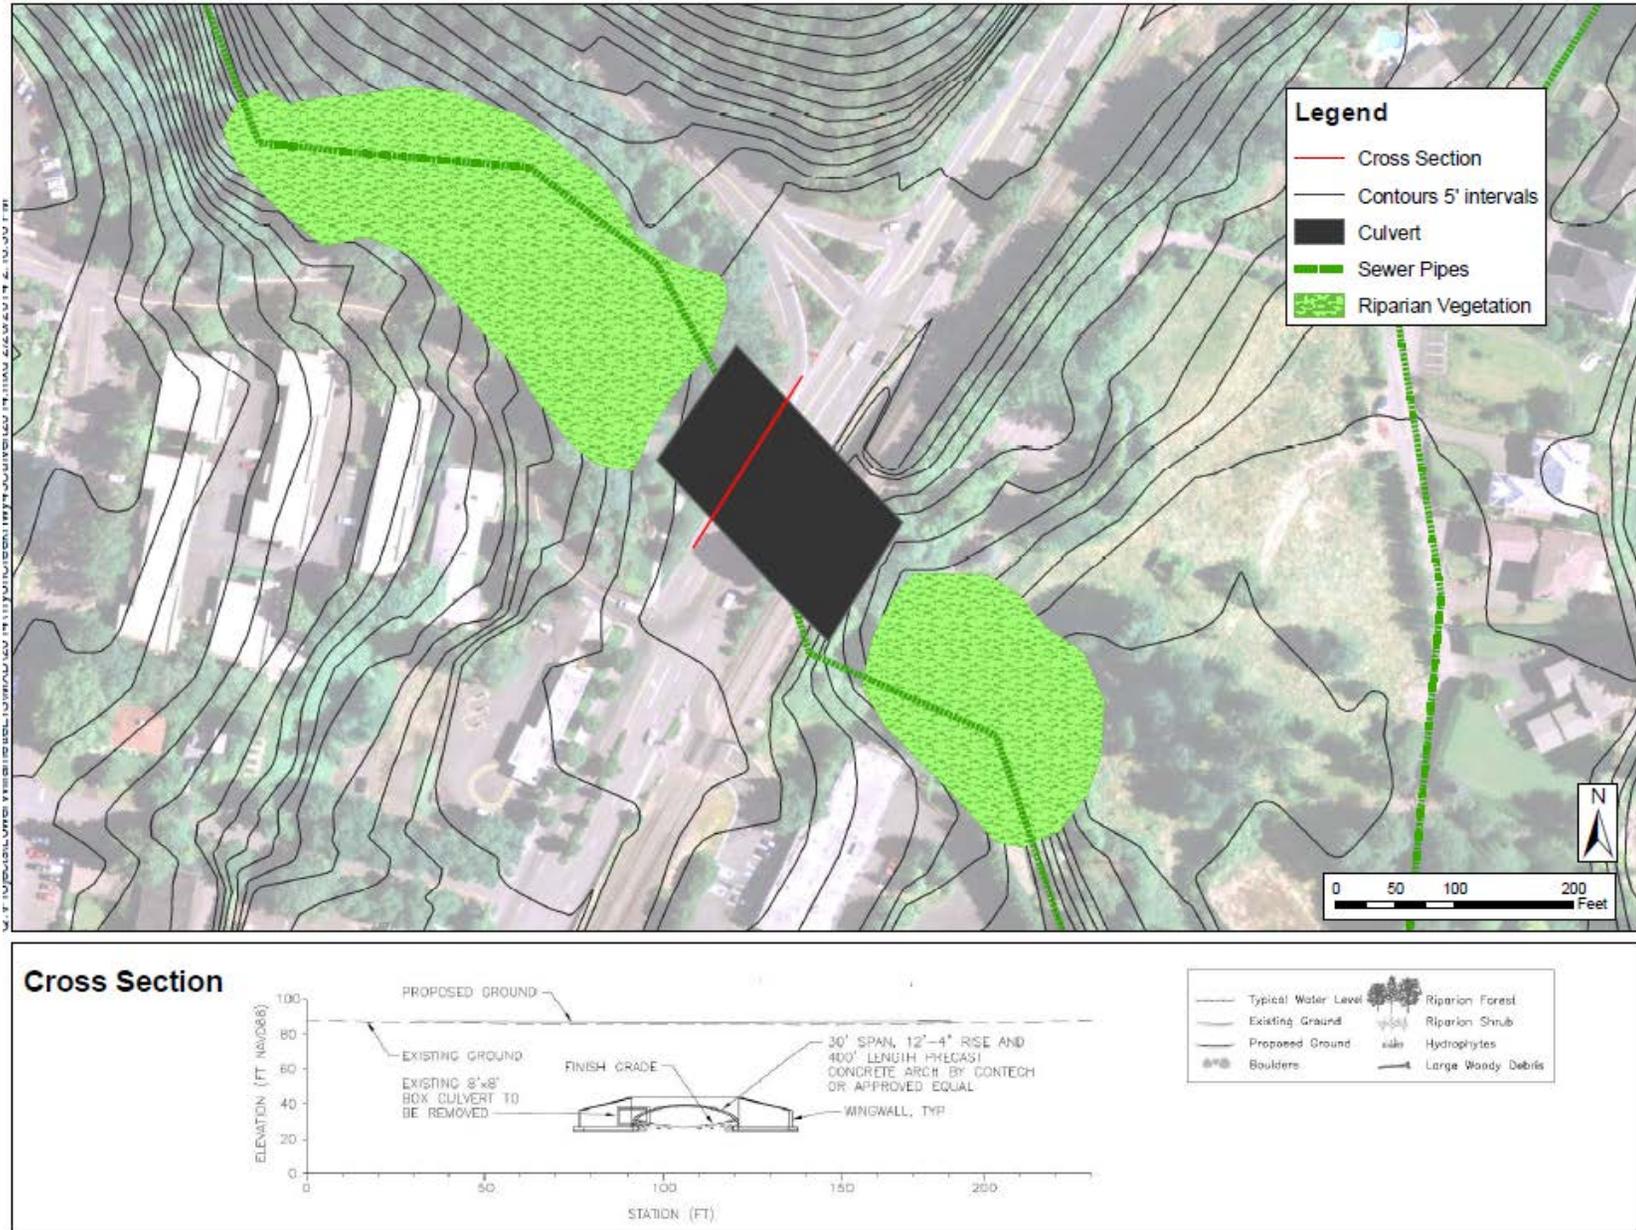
Tryon Creek/Highway 43 Culvert Conceptual Restoration Plan
